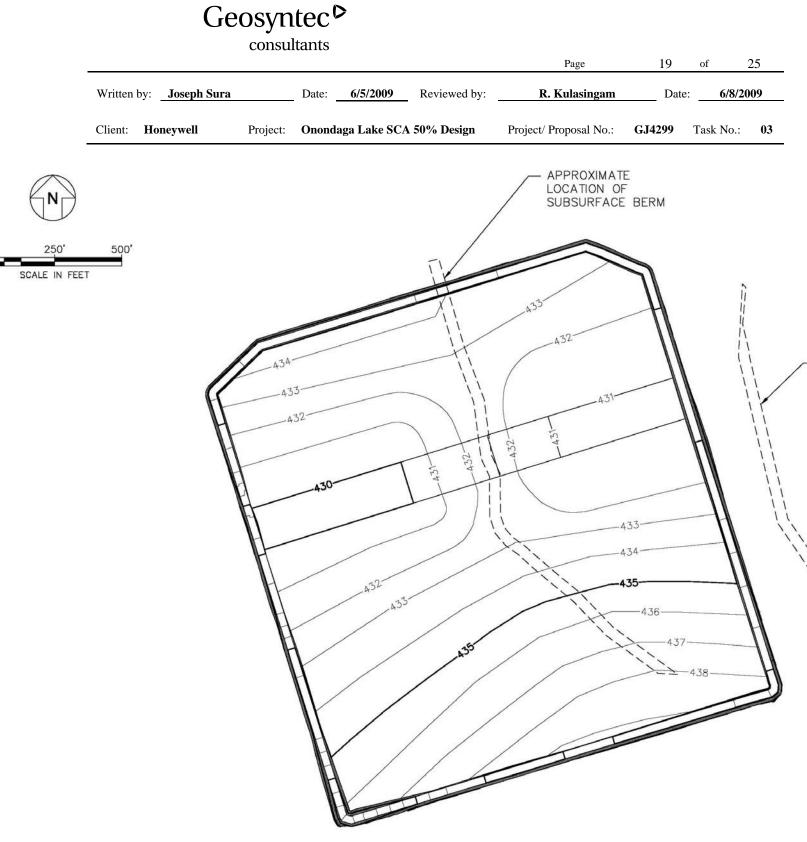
Proposed Gravel Drainage Layer Grading Plan for Option 1 (2.65 million cy)
